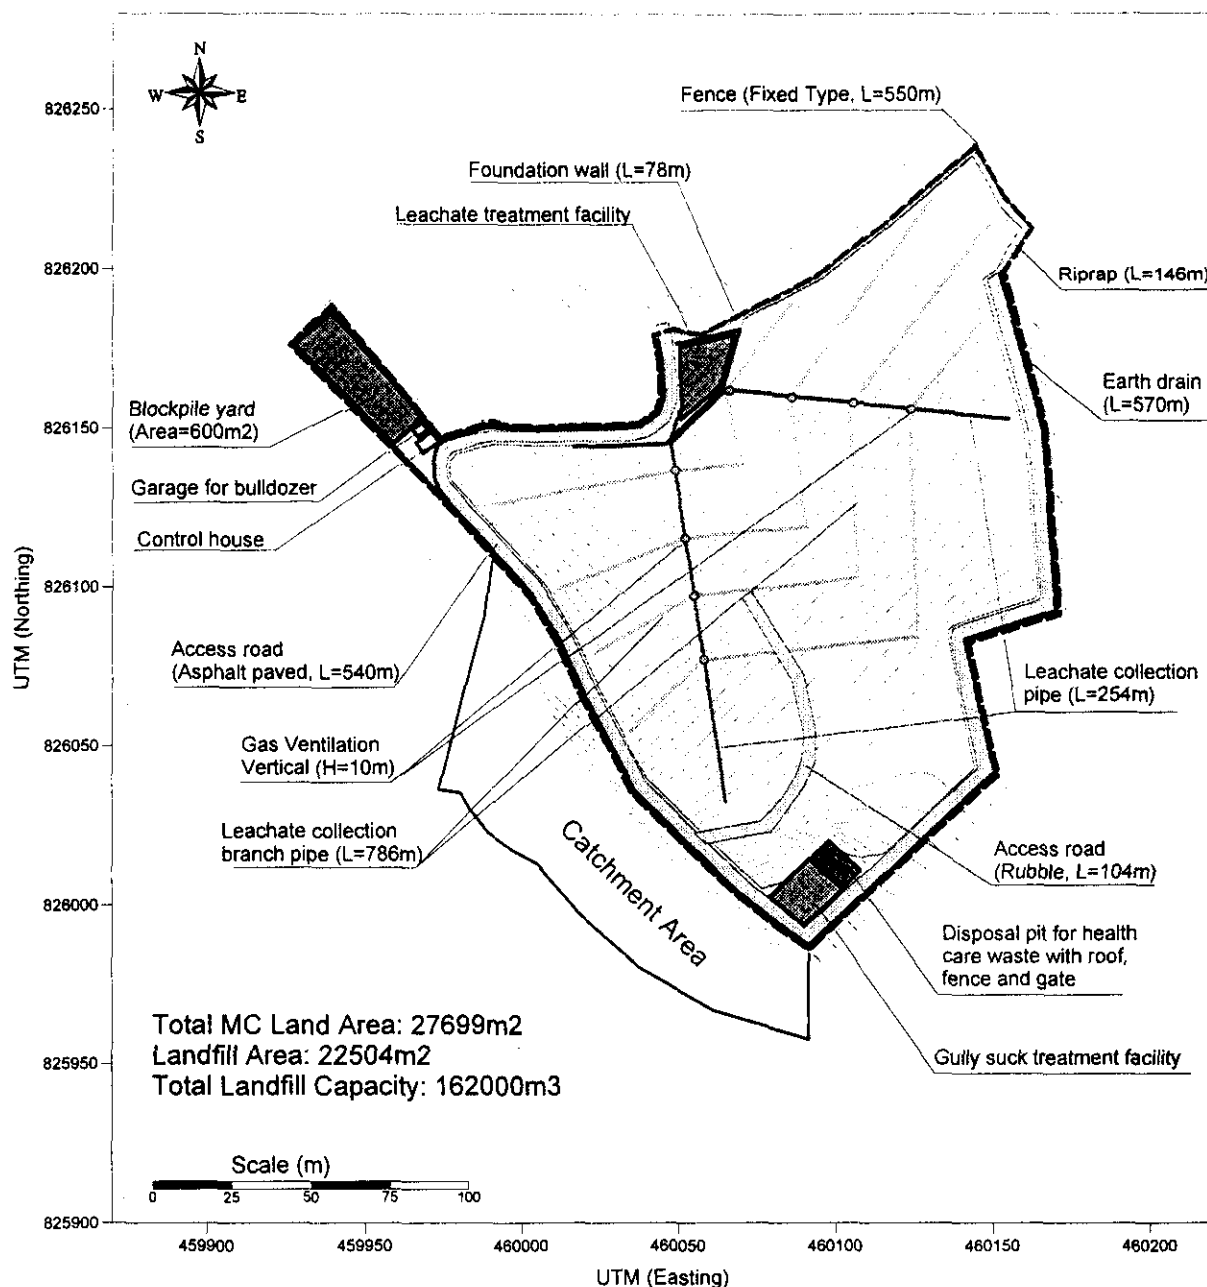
Facility plan of improved Saduganga Landfill Site
